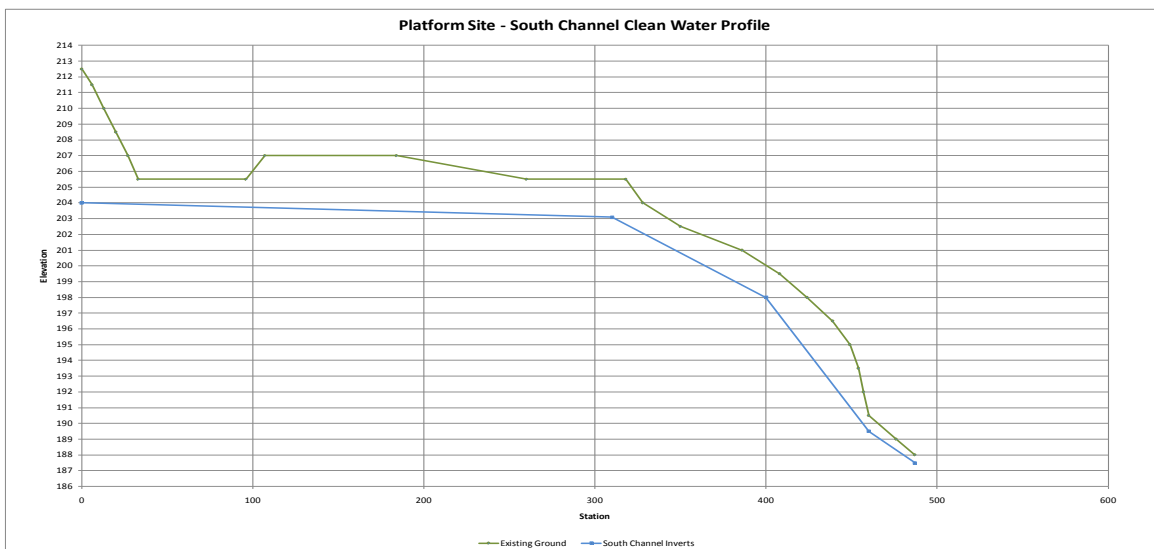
South Diversion Ditch (Ore Stockpile Platform)
